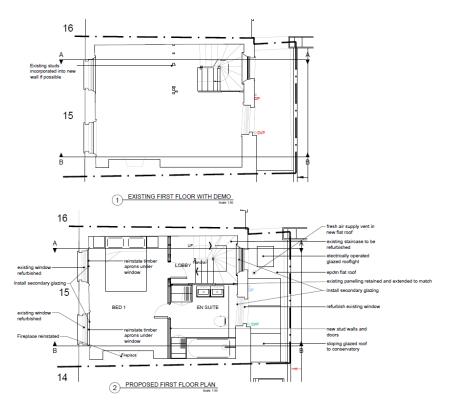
(above): Existing and proposed plans of the first floor showing internal and external alternations proposed
